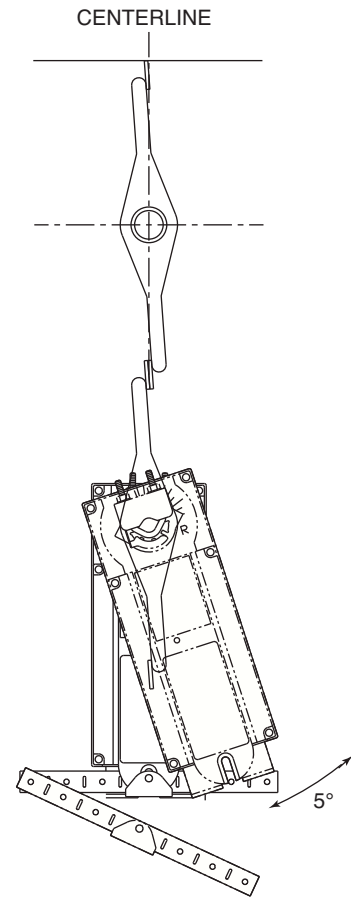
Long Damper Shaft Mounting with Clockwise Spring Return for Normally Closed Damper.
